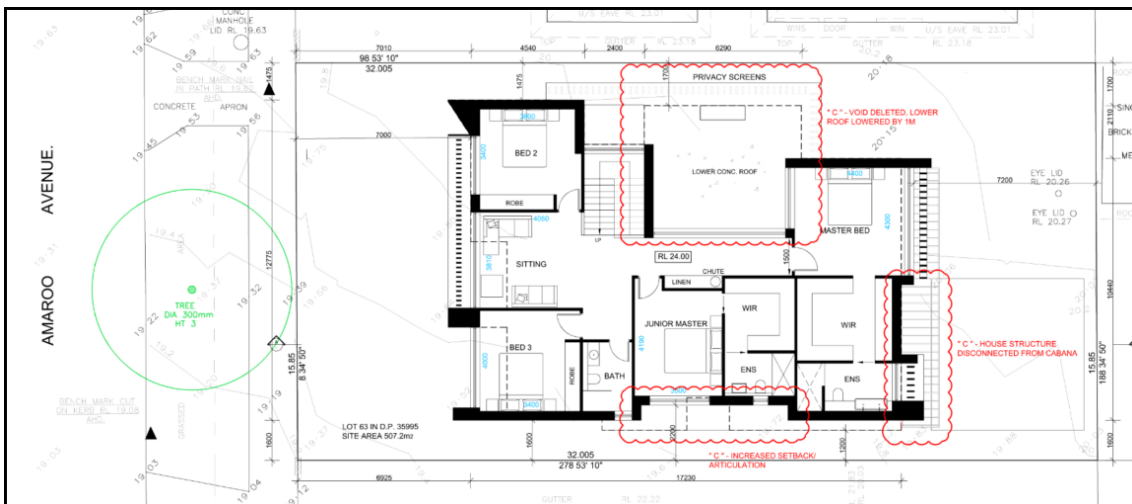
Amended first floor plan 1364 – 02 Rev. C
